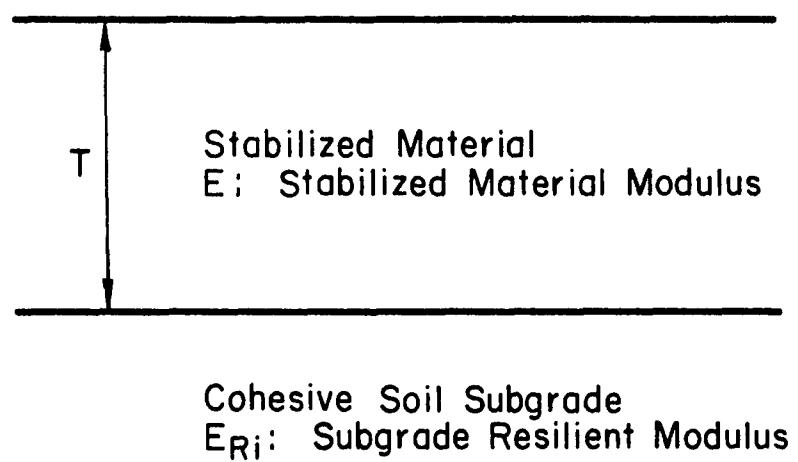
Typical ALRS Stabilized-Base Section Pavement.
